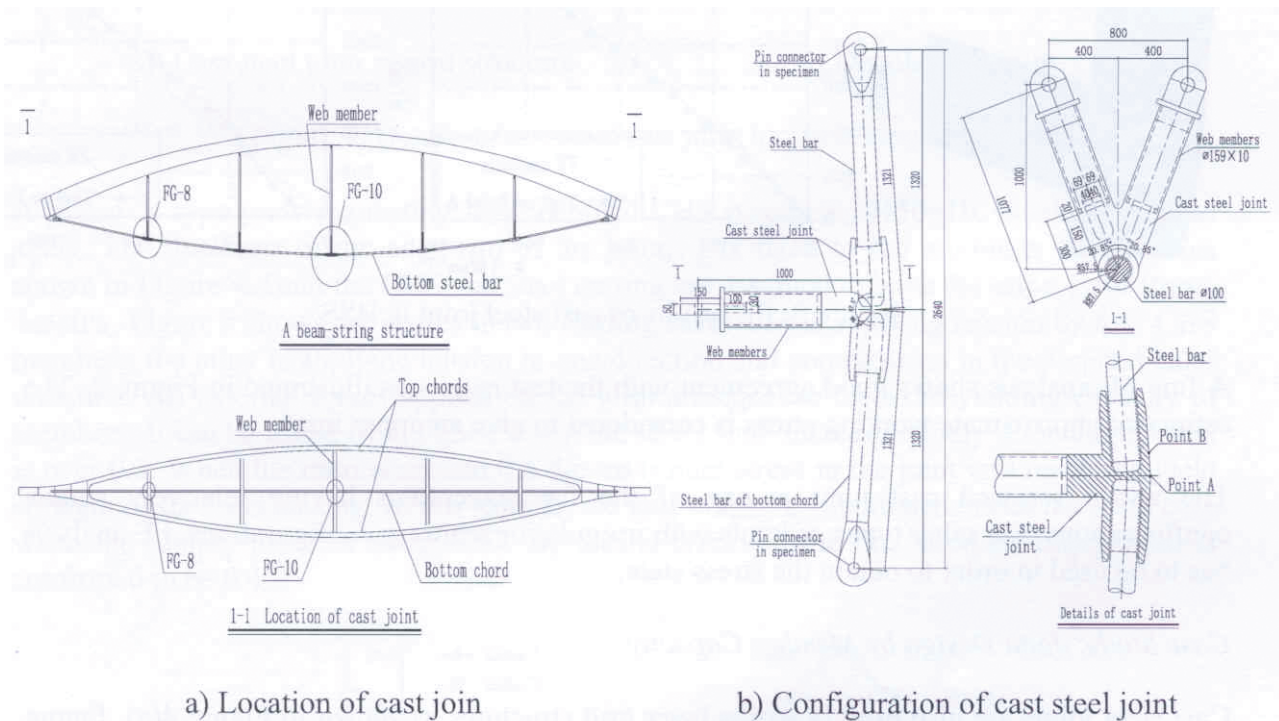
Beam-string truss in elevation and plan, along with cast steel connection detail. (Courtesy of Professor Y.-Y. Chen)
